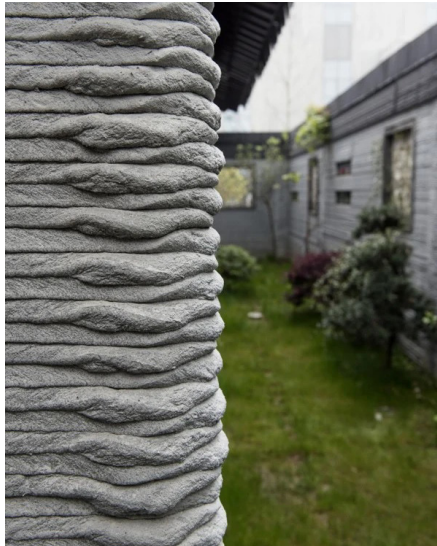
Detail of printed wall [Aldama, Z., 2017]
